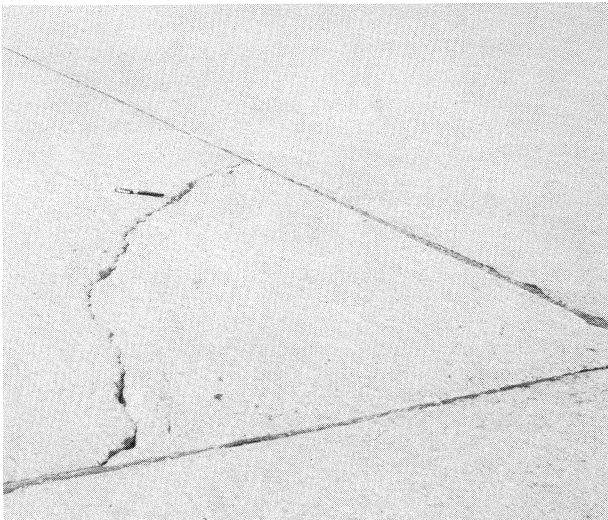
Corner cracking in a Steel Fiber Reinforced Concrete Pavement
